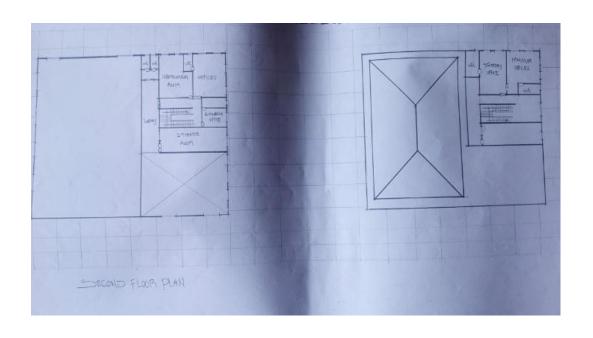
TYPICAL FLOOR PLAN O CASE STUDY TWO
